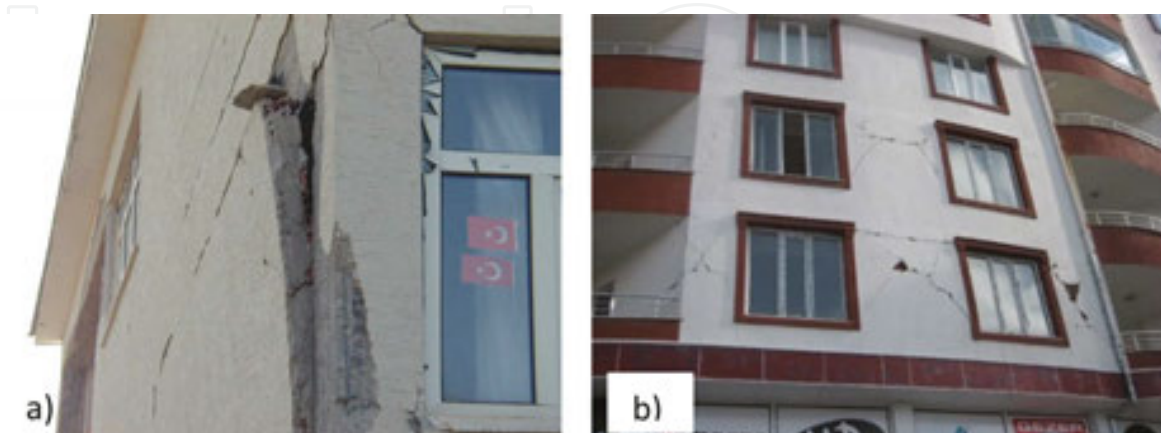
(a) Detachment of infill wall during the Bingöl earthquake and (b) In-plane damage of during the Van earthquake.
